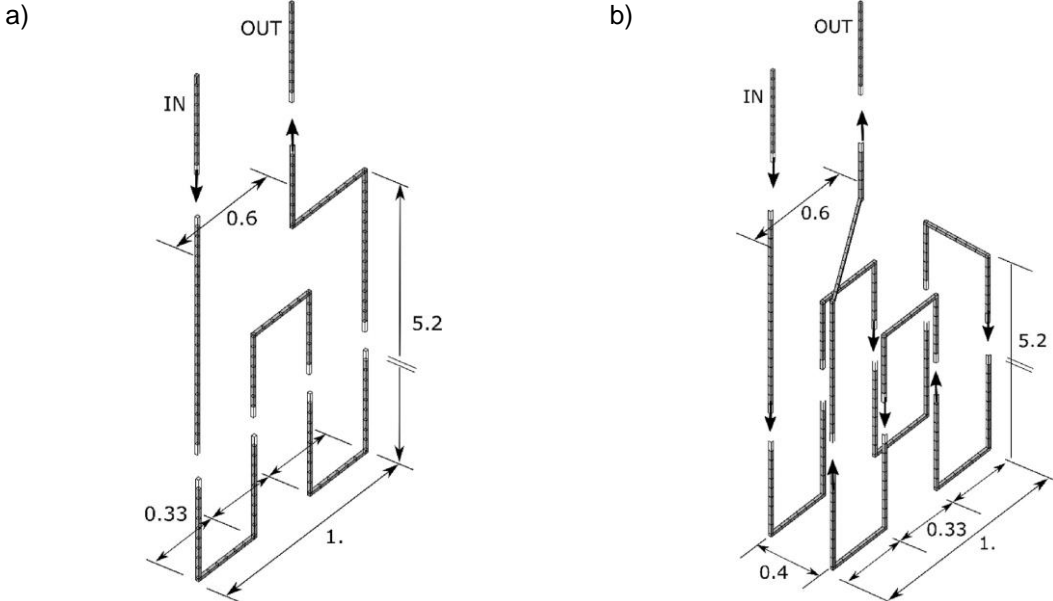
Layout of the enhanced heat exchanger pipe (units in m): a) Single-W, b) Double-W (Sterpi et al., 2020).
